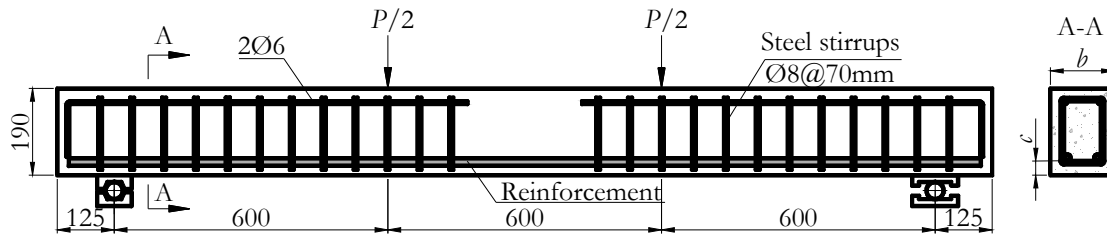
Geometric and reinforcement details (dimensions in mm).
